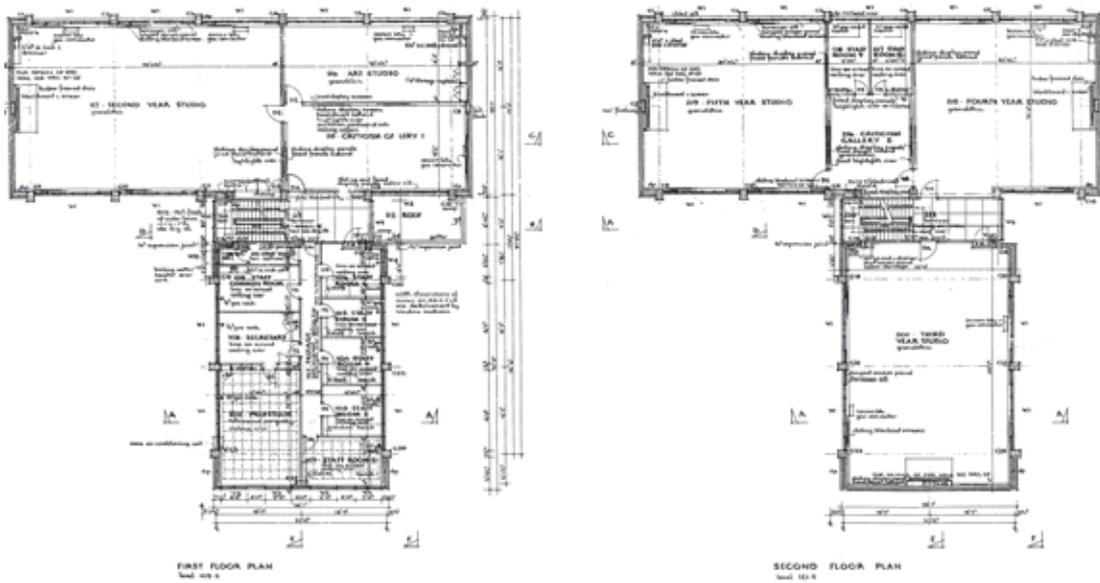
Eric Andrew's documentation of the first and second floor building plans.
